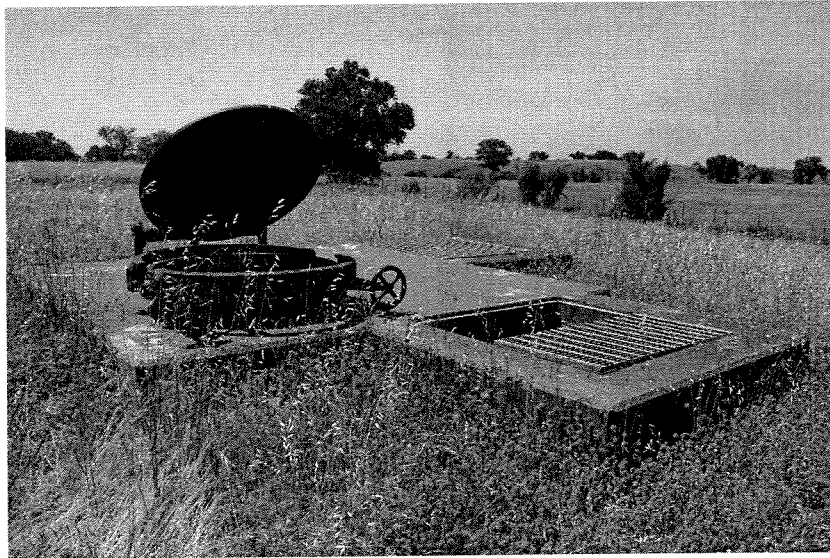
Fan Room for Test Stand No. 3 (Unit 137), Beta Test Complex, 1963-1964. Looking northwest. View of May 2005.
